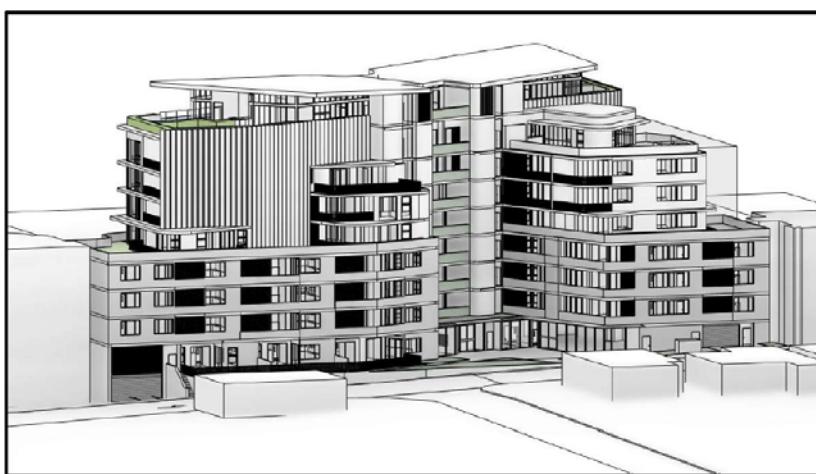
3D image of proposed development (GHD Woodhead, 2021)
